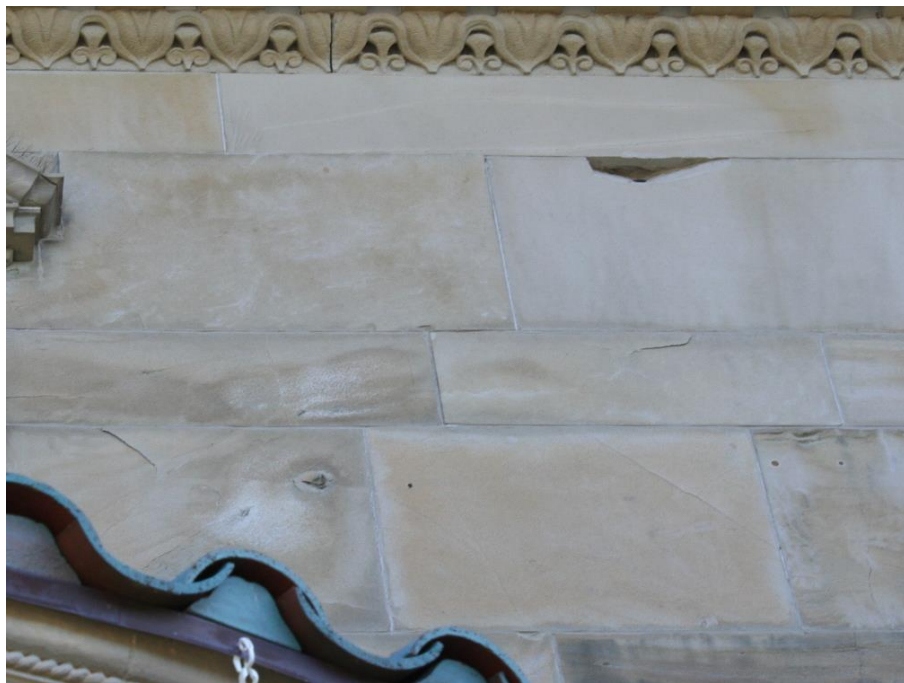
Examples of spalling, cracking, and staining at ashlar masonry.
